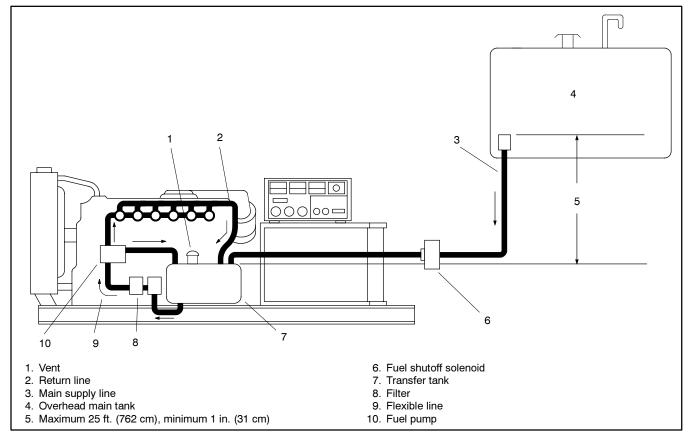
Diesel Fuel System with Overhead Main Tank and Transfer Tank
